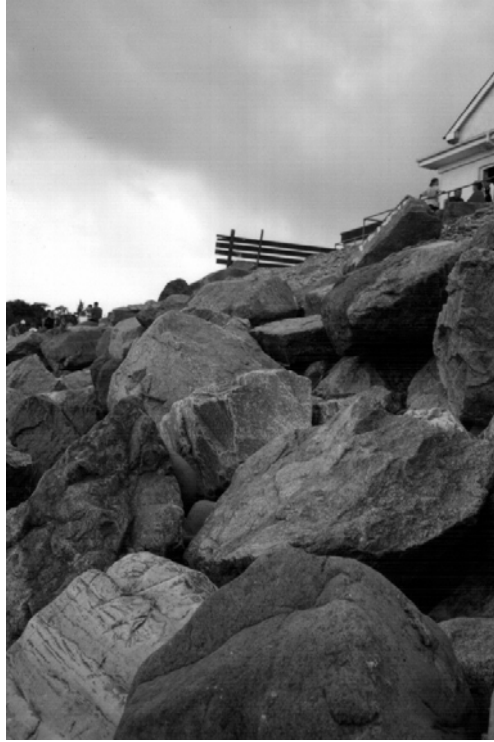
Damage encountered at Wiseman's Bridge revetment in front of the hotel restaurant.
